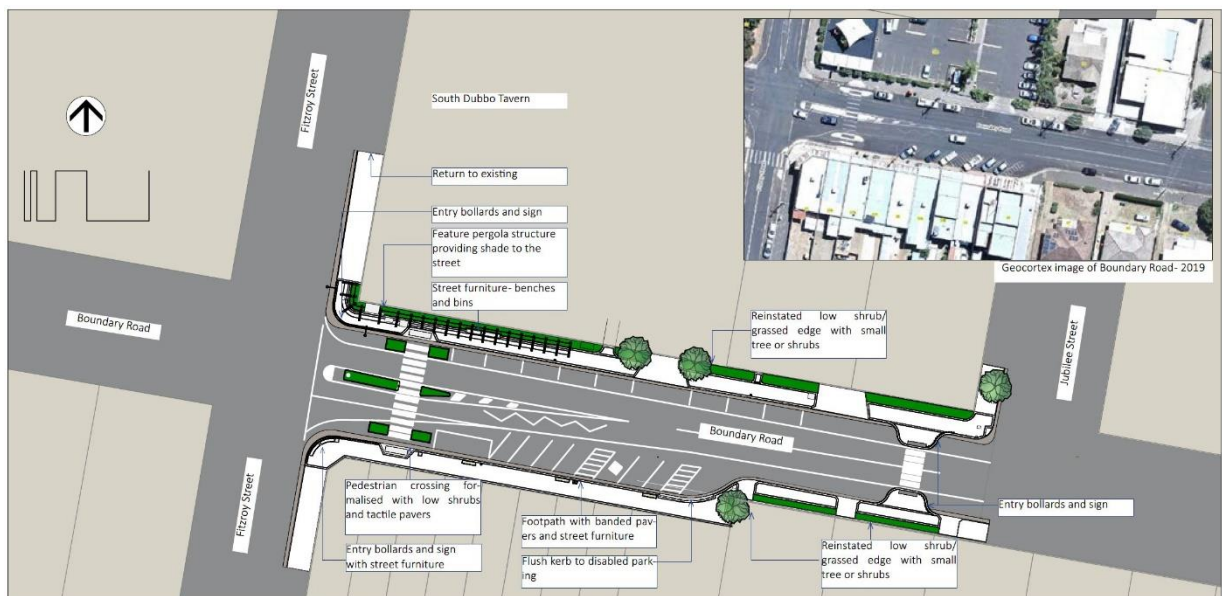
Boundary Road Shopping Precinct Proposed Arrangement
